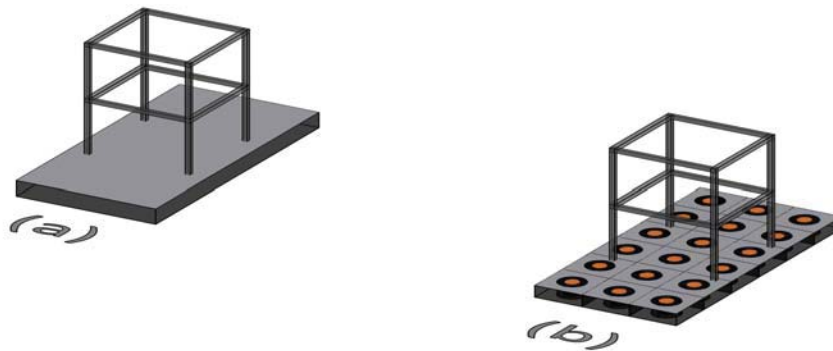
, Frame structure with (a) Concrete foundation (b) Periodic foundation,
